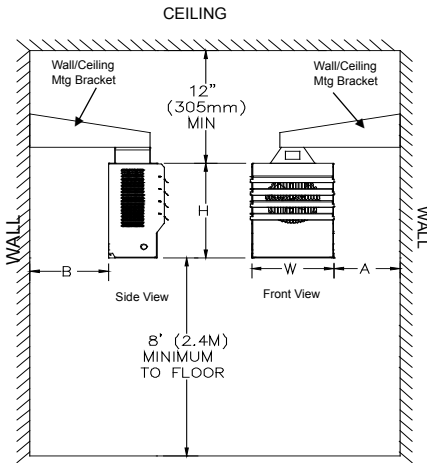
HORIZONTAL WALL MOUNTING WITH MOUNTING ARM
